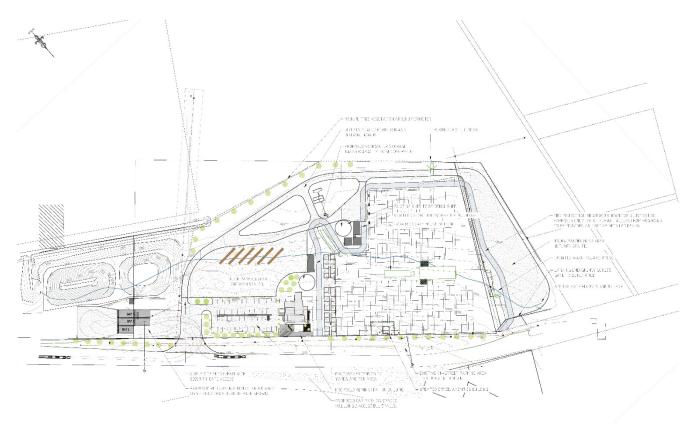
Site Plan of the Proposed Re-development (Kelley Covey)
